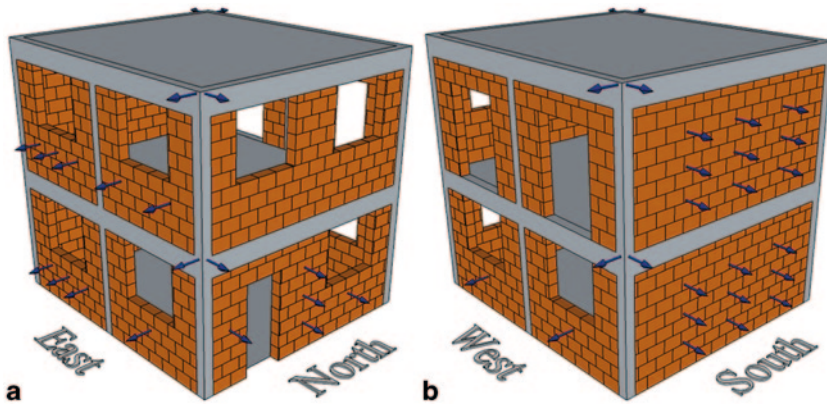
Accelerometers setup for out-of-plane wall behaviour
